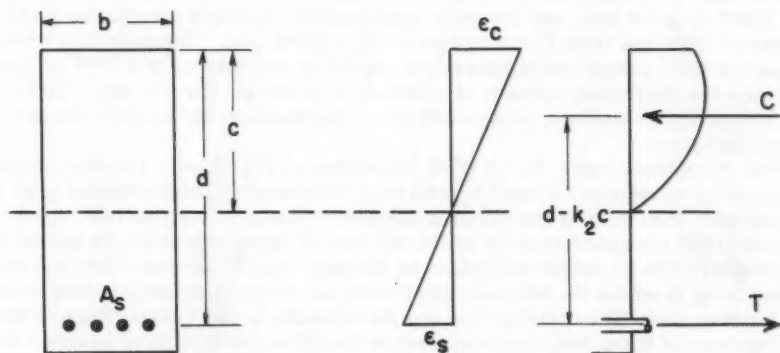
CONDITIONS IN REINFORCED CONCRETE BEAM IN BENDING
